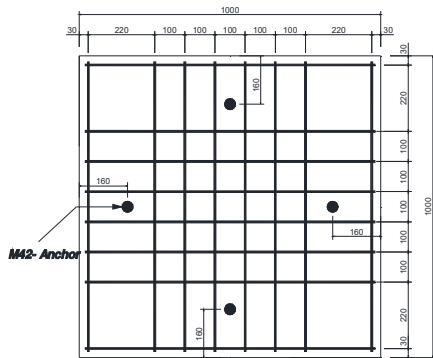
Configuration of test block: M42 anchor, D6 stirrup
